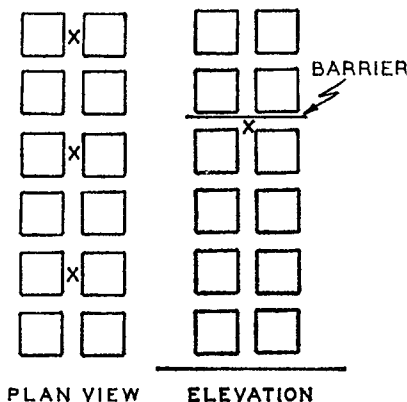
In-Rack Sprinkler Arrangement, Class I commodity, Maximum Height of Storage 25 ft (7.62 m) to 30 ft (9.15 m)
